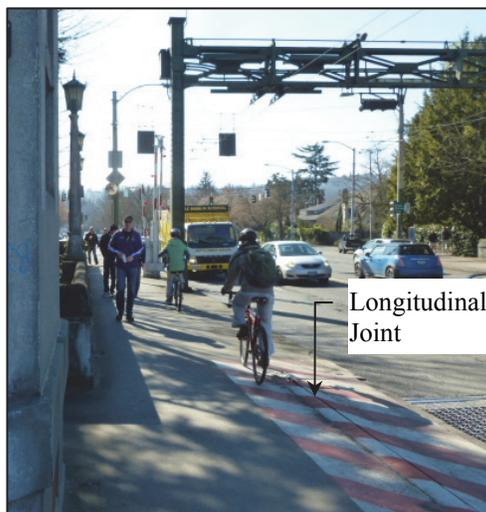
Typical Bridge Longitudinal Joint at Trunnion
